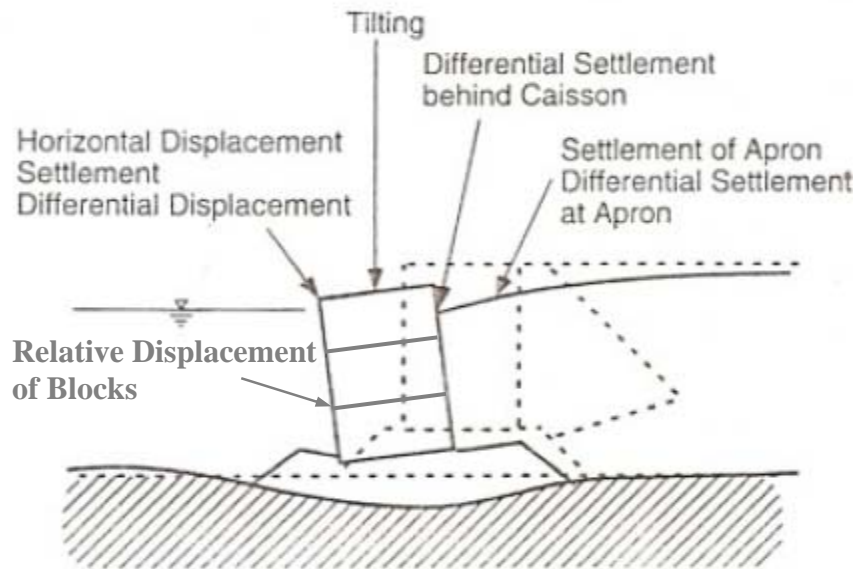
and Figure 2.16 show failure modes of block type gravity walls. A gravity quay wall resting on a firm foundation moves toward the sea when earth pressure from the backfill increases in addition to the effect of an inertia force on the wall body (see Figure 2.15). Tilt may also occur if the ratio of width to height of the wall is small.
